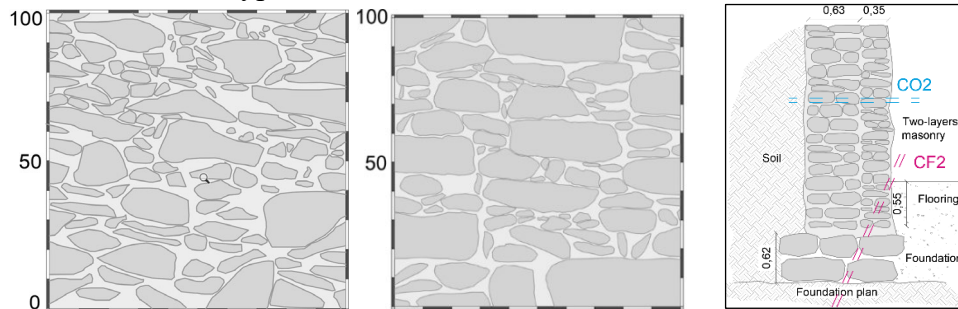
Masonry wall facing and section of the Masegra Castle masonries
